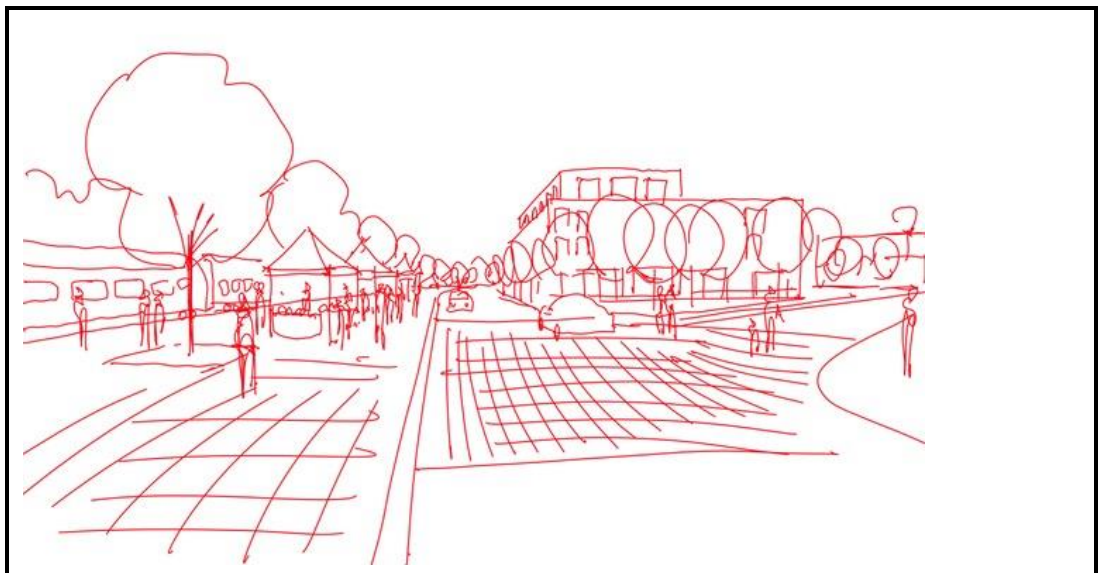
(Corner of Albert and Toronto St. looking east to Town Square)
